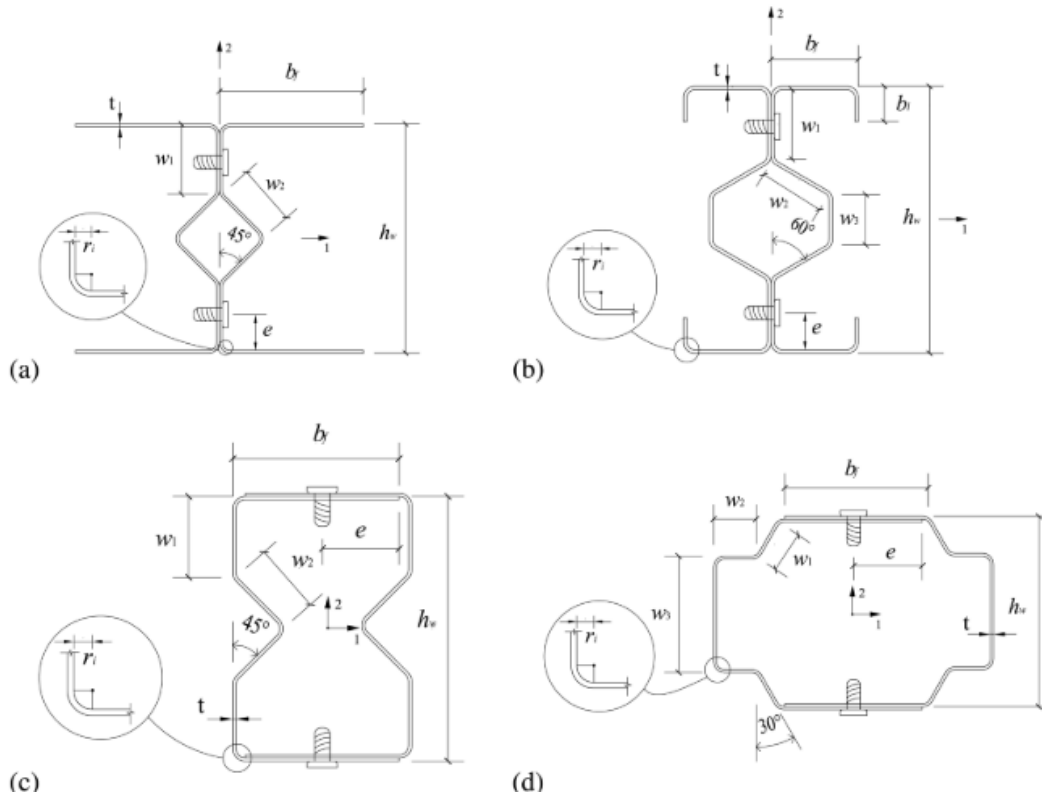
Definition of symbols and location of screws in cross section: (a) OV section; (b) OI section; (c) CV section; (d) COF section (bending about Axis 1) and COW section (bending about Axis 2) [74].
